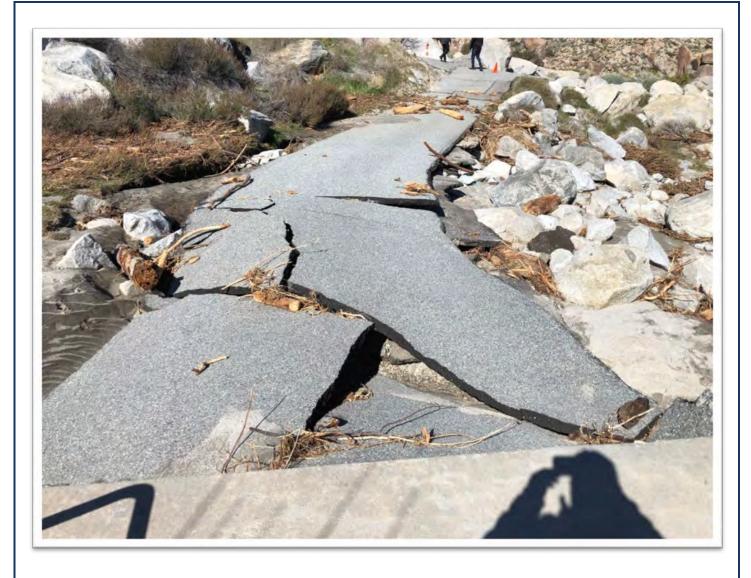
The west approach to the Falls Creek Bridge after the storm.
